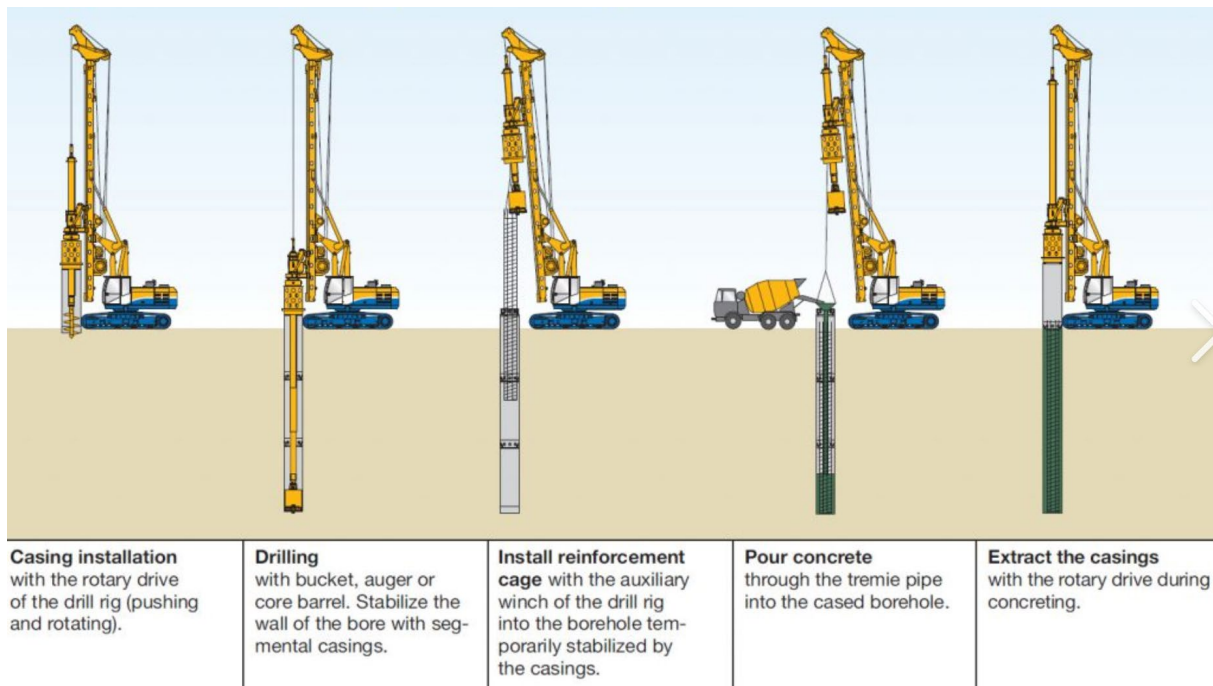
BORED PILE INSTALLATION - TYPICAL PROCESS
